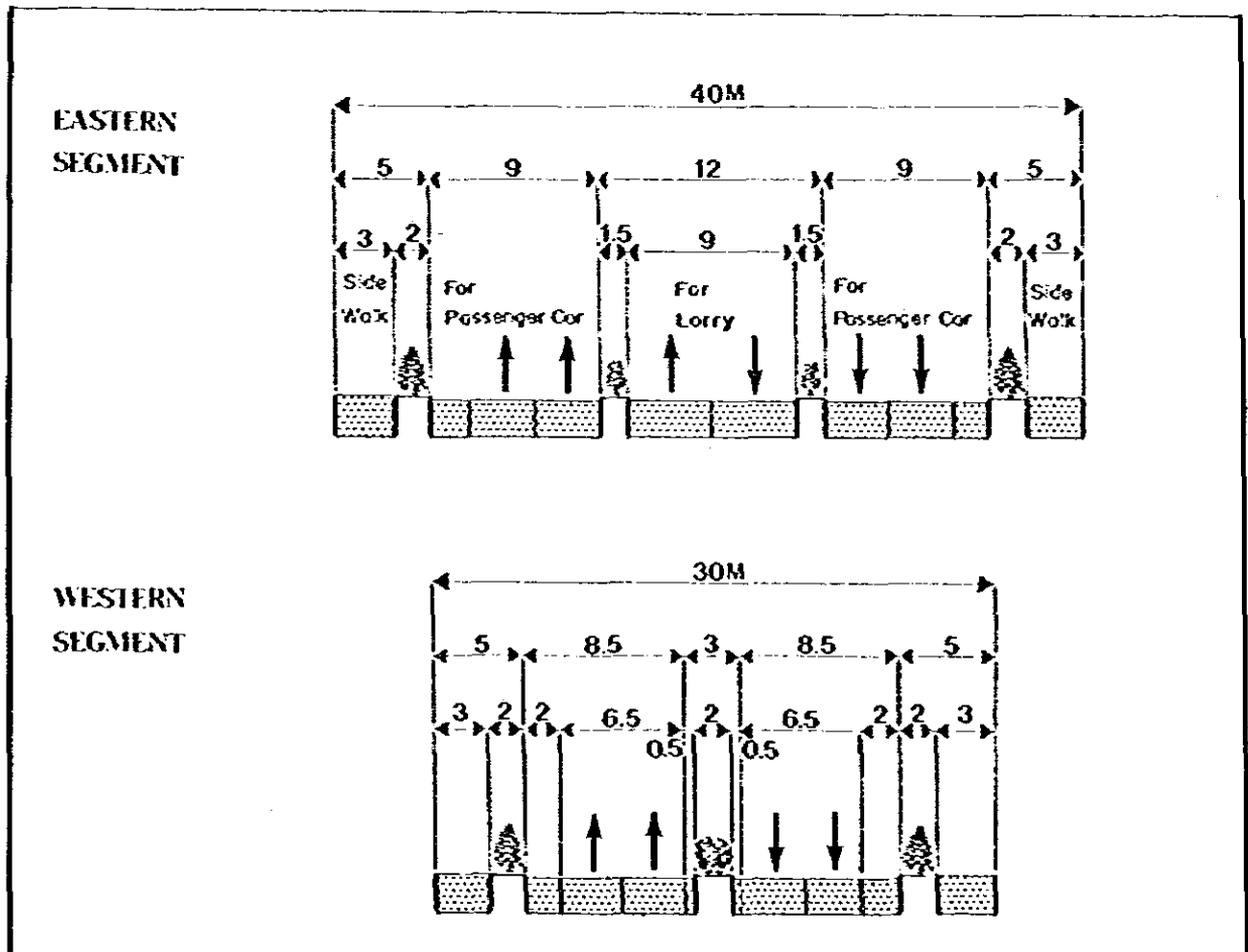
TYPICAL CROSS SECTION (ULTIMATE PLAN) OF THE INNER RING ROAD
